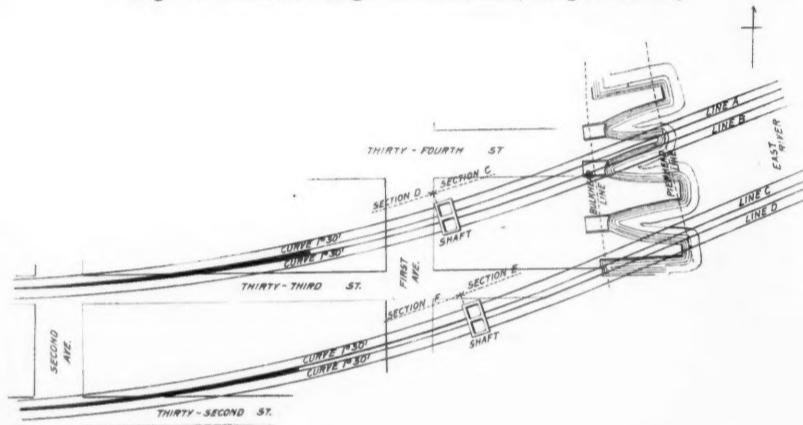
Plan of Tunnels at Manhattan Shaft.
